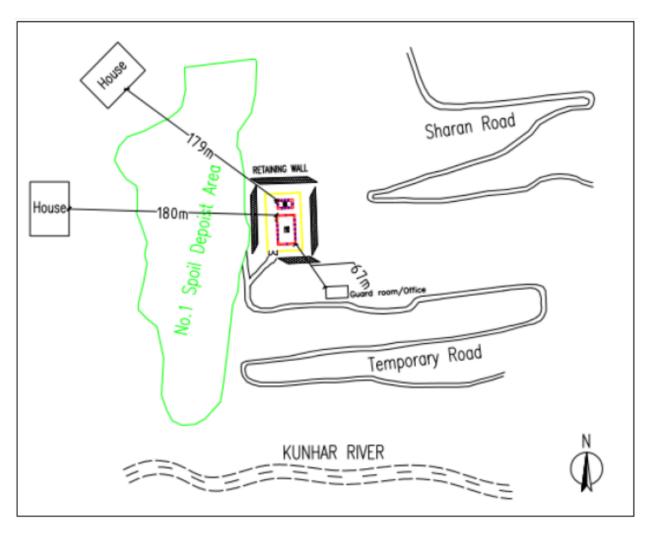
Magazine Camp Layout Plan to be constructed at Adit-2 (Ghanool Area)
